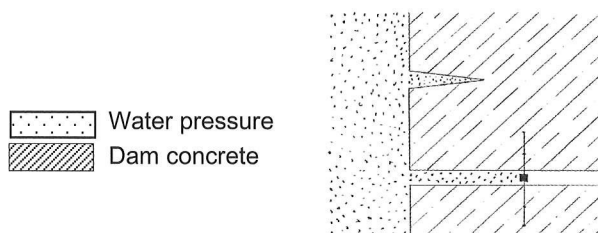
Water pressure in cracks at the upstream face and in the perimetral joint.
